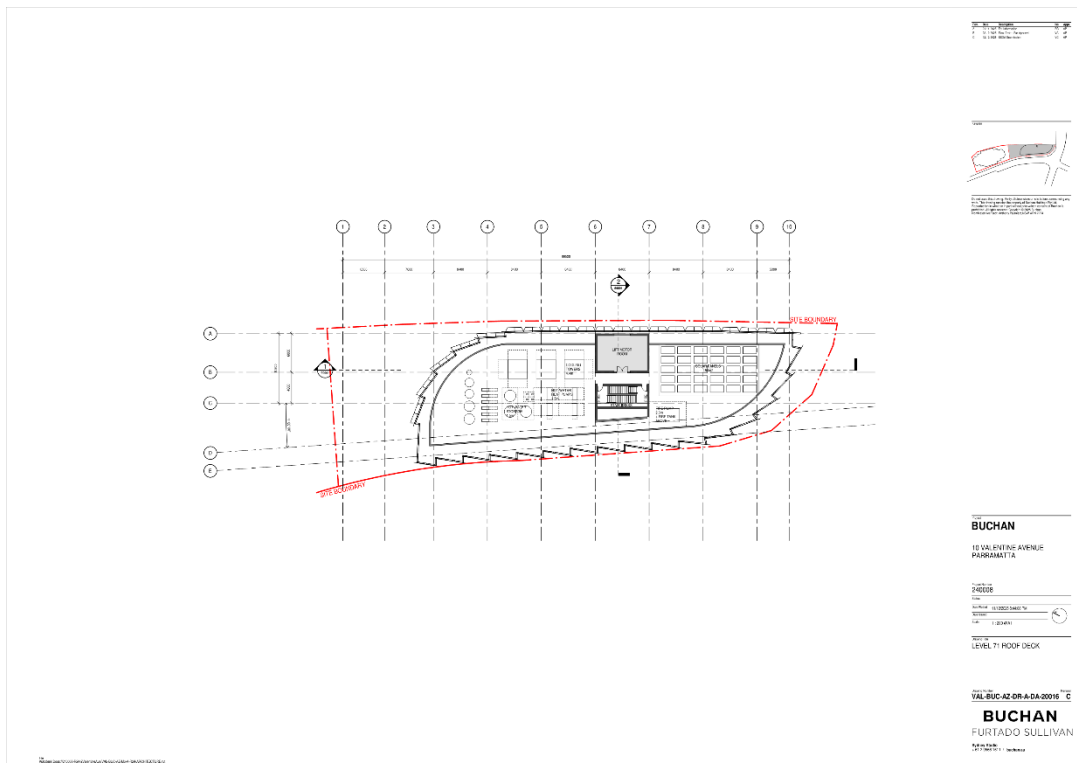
Roof plan, VAL-BUC-AZ-DR-A-DA-20016 (Source: Buchan)
